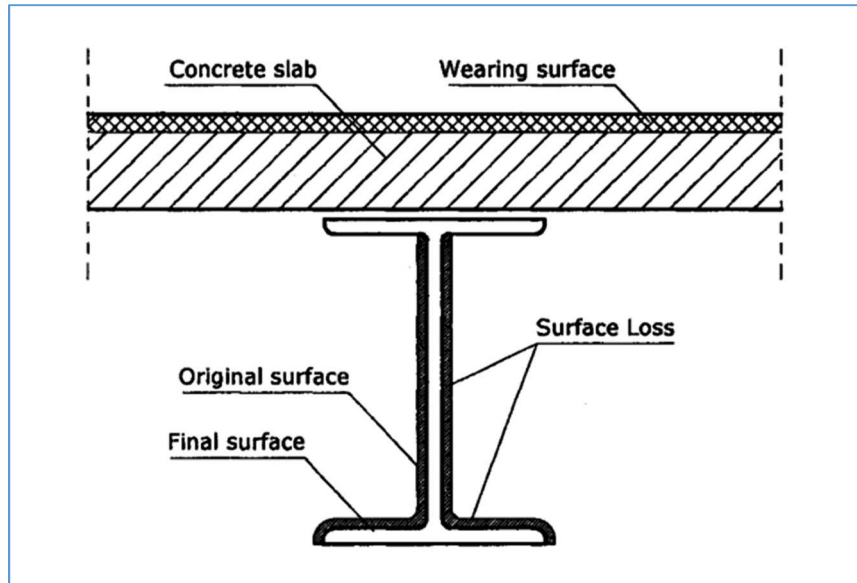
Corrosion on typical steel girder section (Czarnecki, 2006)
